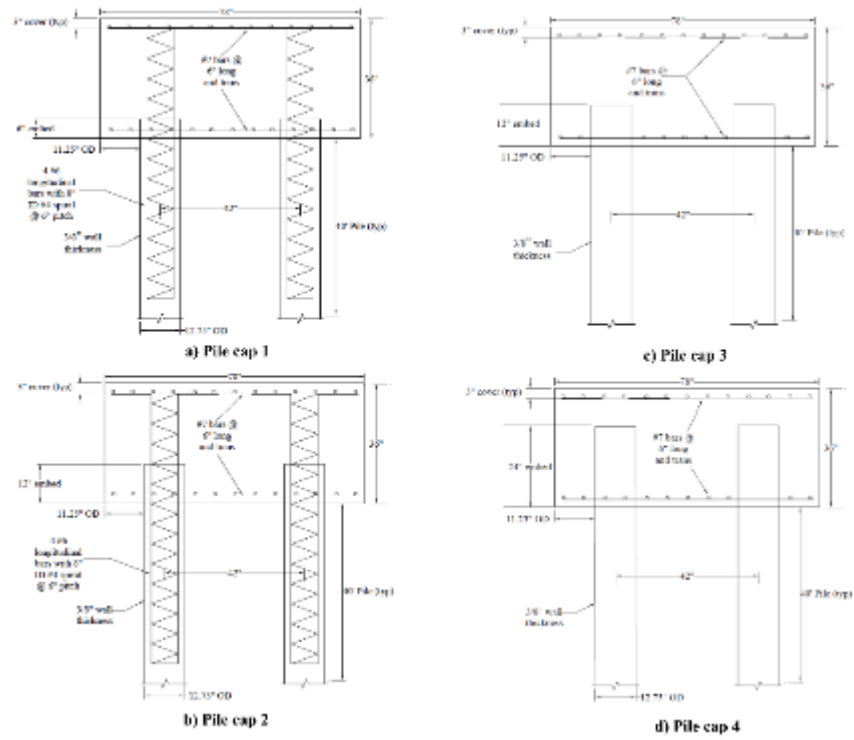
Test specimen details, Rollins & Stenlund (2010)
